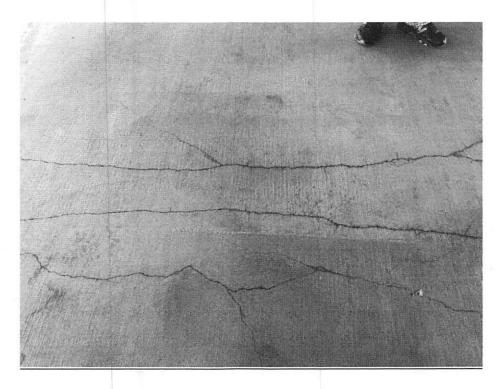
Slab cracks along the sides of a soffit beam.
